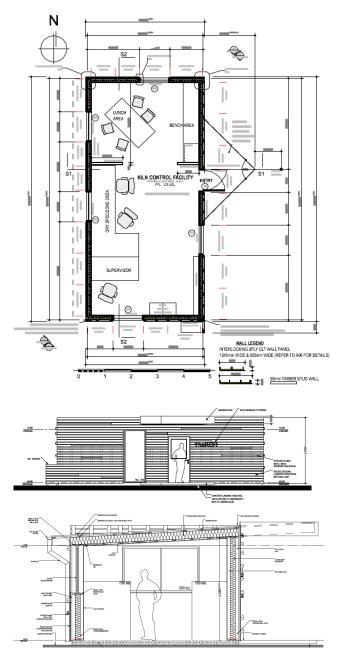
Concept drawings of the first structure using the Interlocking 3ply CLT/OSB wall panel
